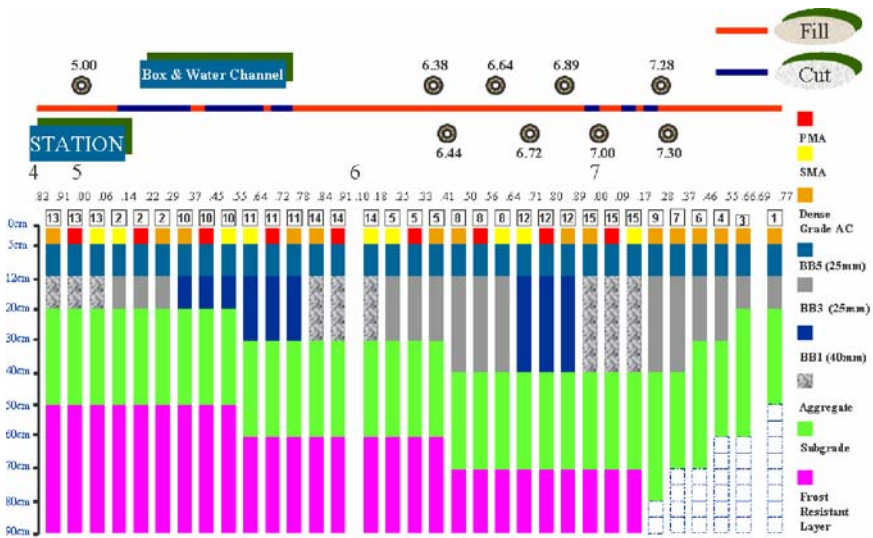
Layout of asphalt pavement cross-sections applied in the test-road
